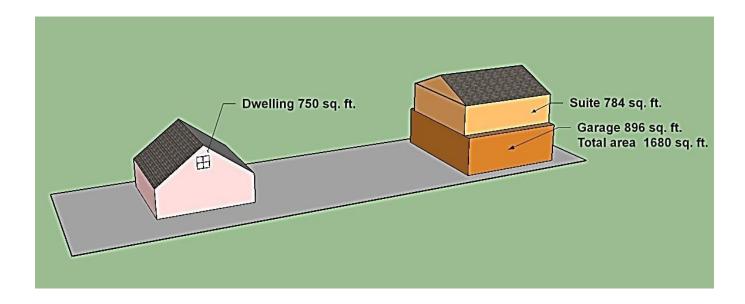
<u>Garage Suite - Small Dwelling - Maximum Size when Not Restricted by Size of Dwelling</u>
